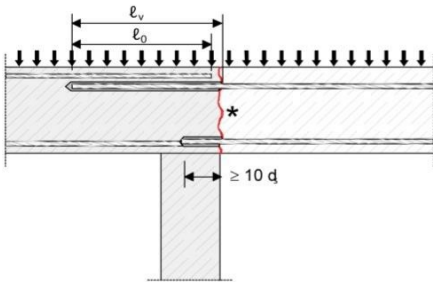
End anchoring of slabs or beams, designed as simply supported.
